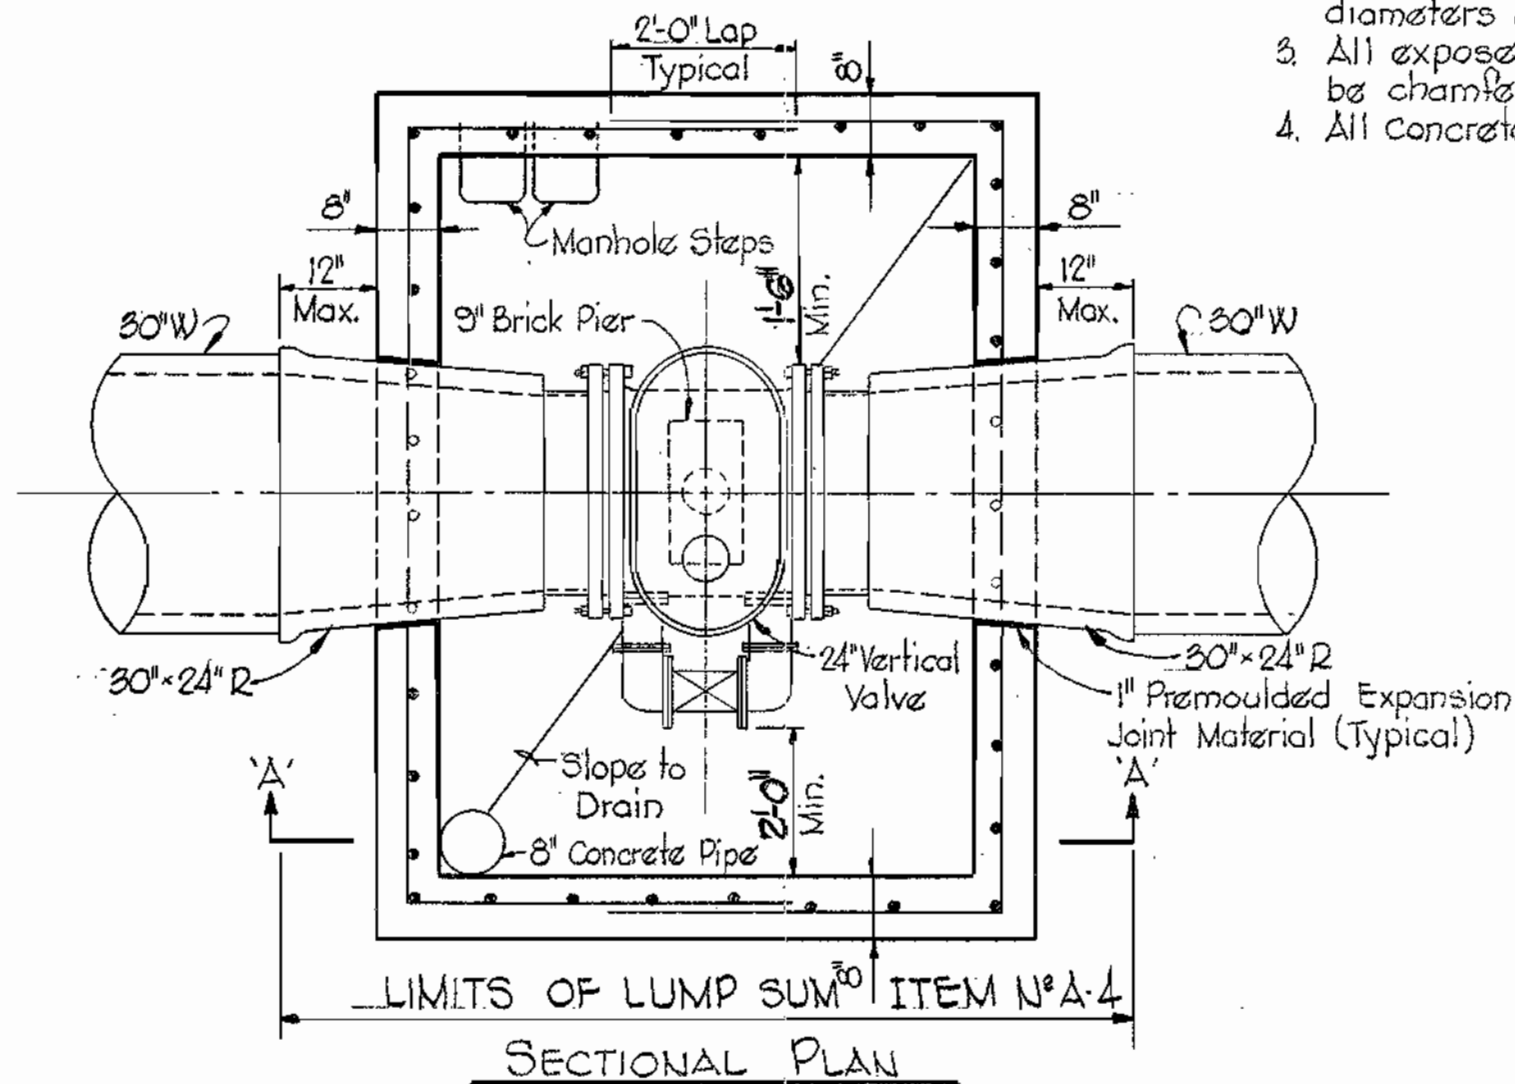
DETAIL OF AIR RELEASE AND ENTRY PORT MANHOLE
